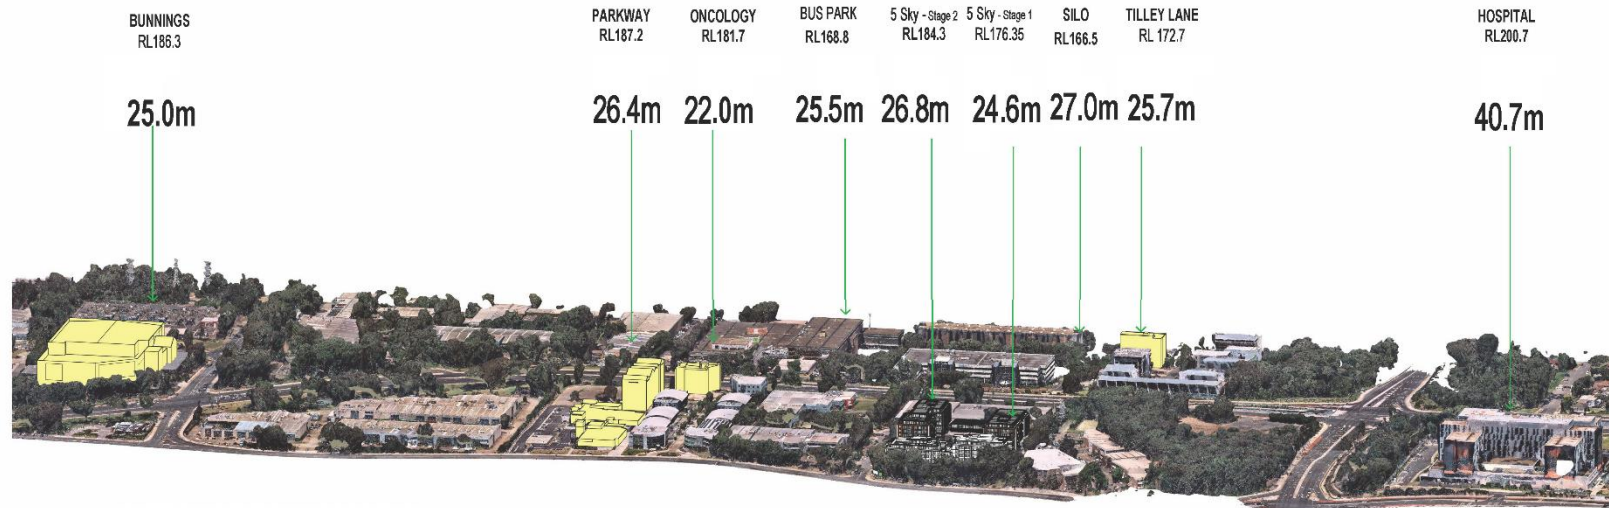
Cross-section of development along Frenchs Forest Road looking south (Source: PA Studio Architects)
